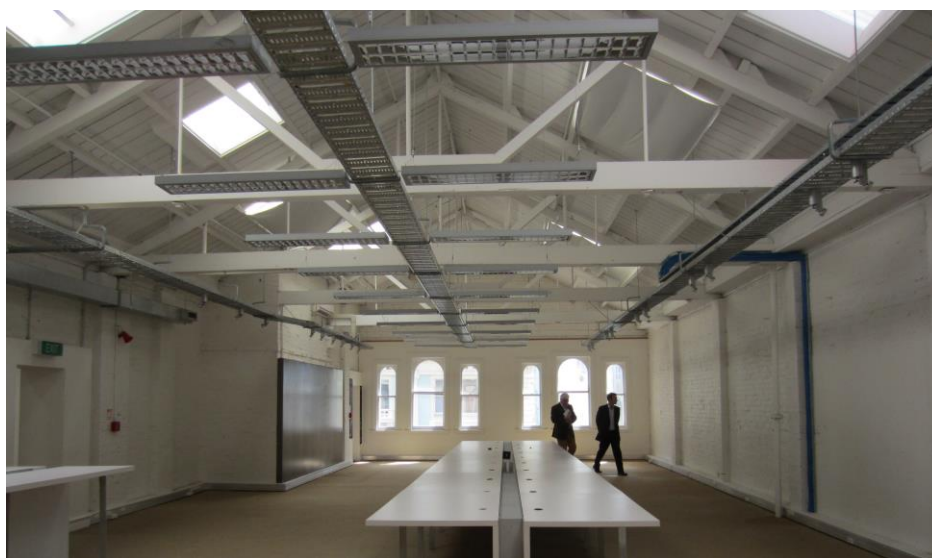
Interior of Level 3 looking towards the heritage façade, showing the exposed timber trusses
